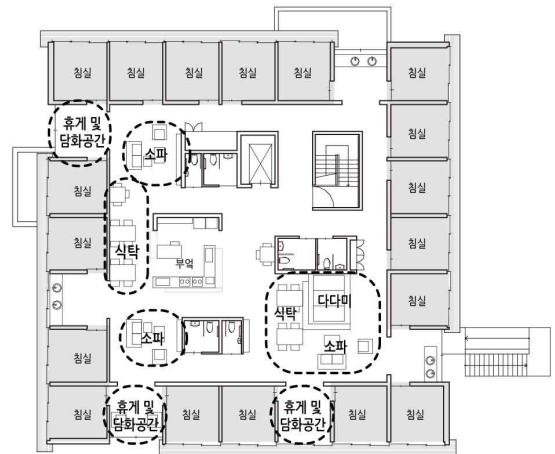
Examples of the public spaces(Case E : Floor Plan)
